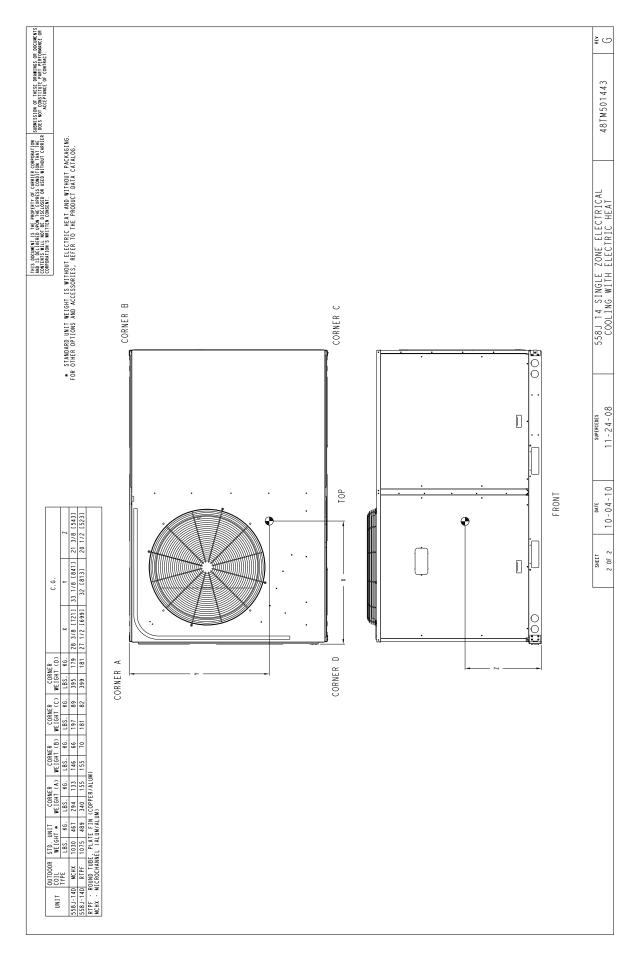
Unit Dimensional Drawing — Size 14 Unit (cont)
